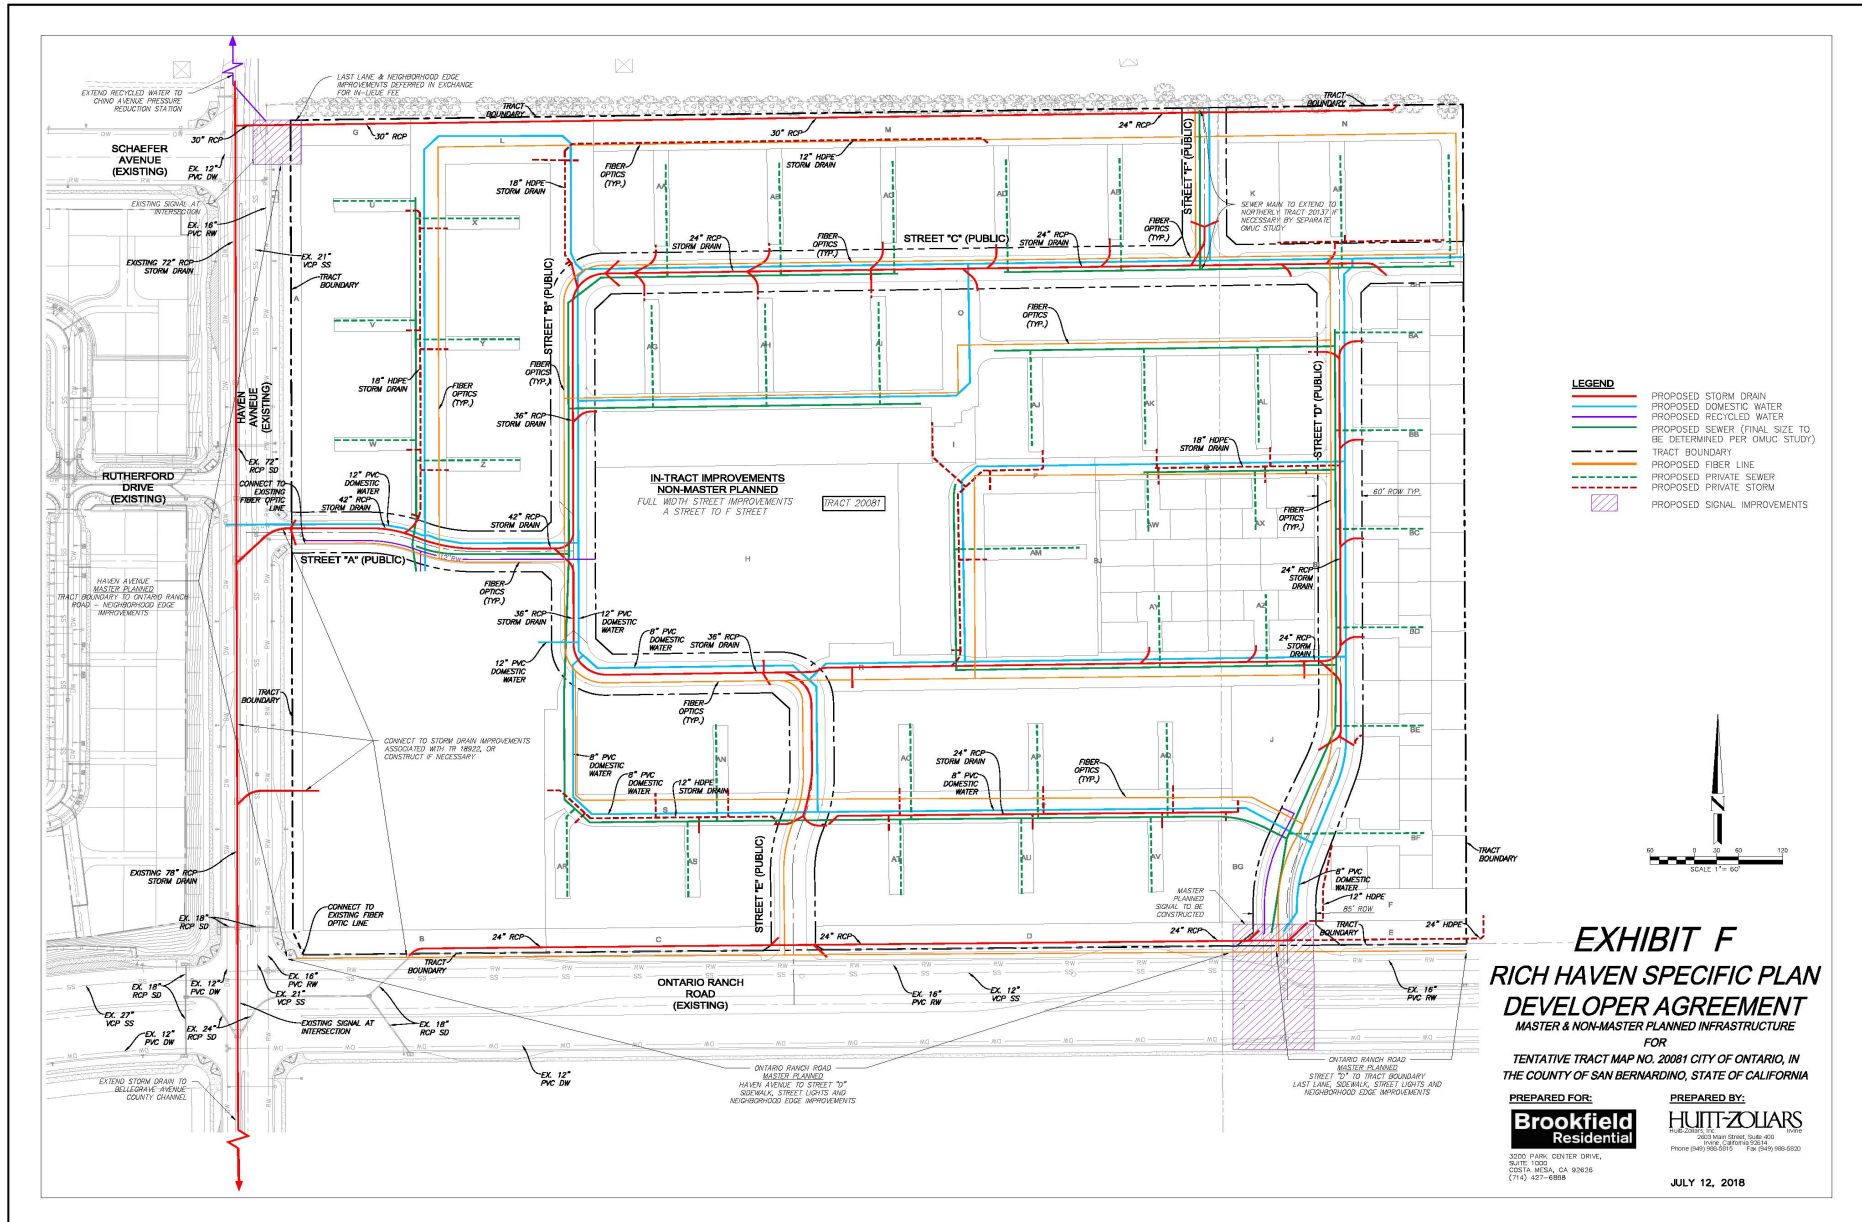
EXHIBIT F RICH HAVEN SPECIFIC PLAN DEVELOPER AGREEMENT MASTER & NON-MASTER PLANNED INFRASTRUCTURE FOR
